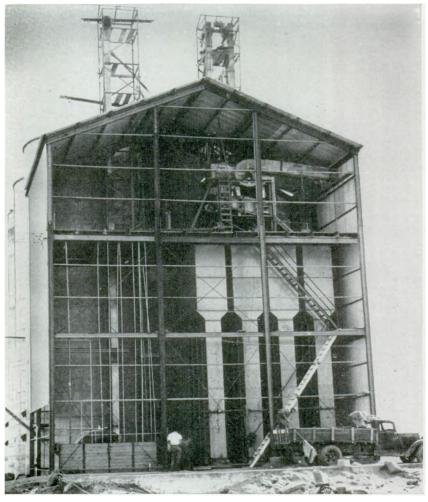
Unloading rice at a modern rice drier. The building, the front wall of which has not yet been completed, has four drying units, with elevators to convey the rice to and from them. Above the drying units is the cleaning machinery. A fan (lower left) forces the warm air into the driers.
